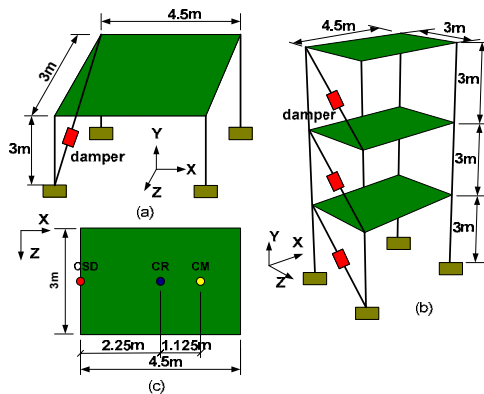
(a) one-story building (b) three-story building (c) floor plan.
